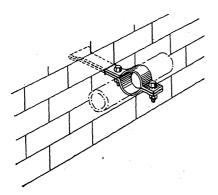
A STRONG IRON CLIP CLASP THE PIPE AND BUILT INTO THE WALL WILL FORM AN ANCHOR
